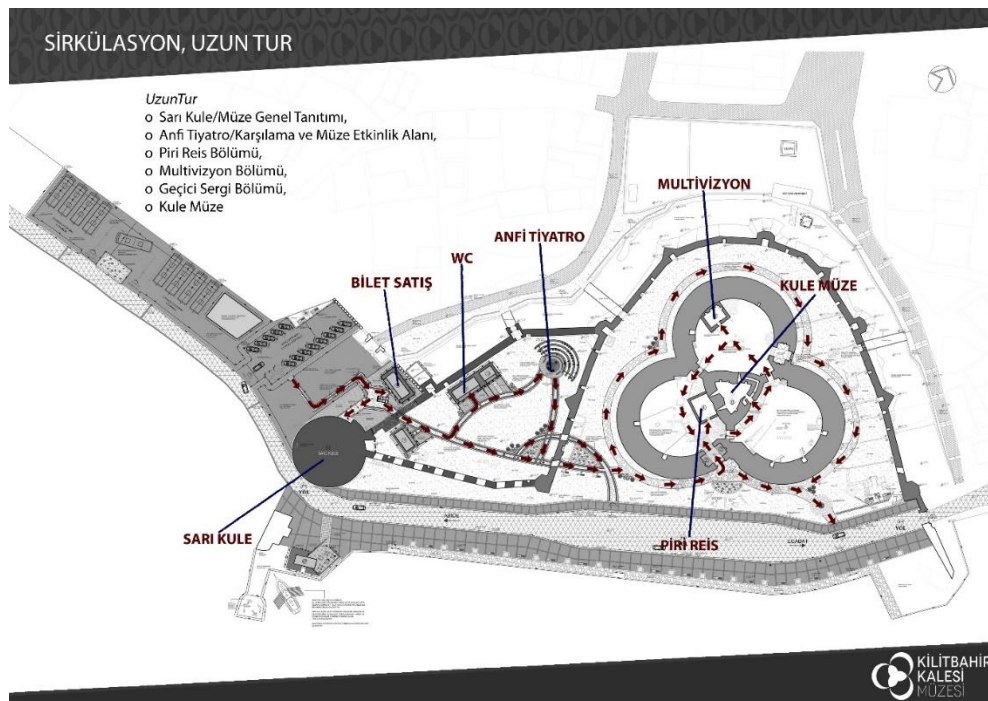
Kilitbahir Castle Site Plan-Long Tour Route, K. Duyar.
